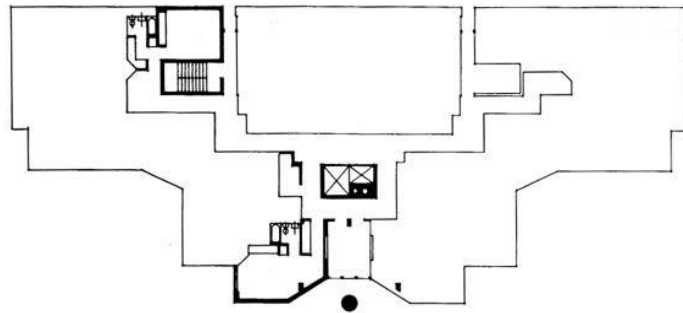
Plan, Guild House 1960-1963 A.D. (ประเสริฐสุข, 2005)
